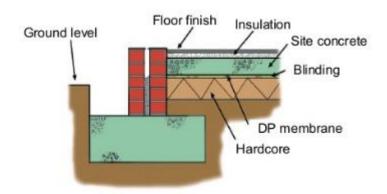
Curing Concrete Source: slide share – section of solid ground floors
